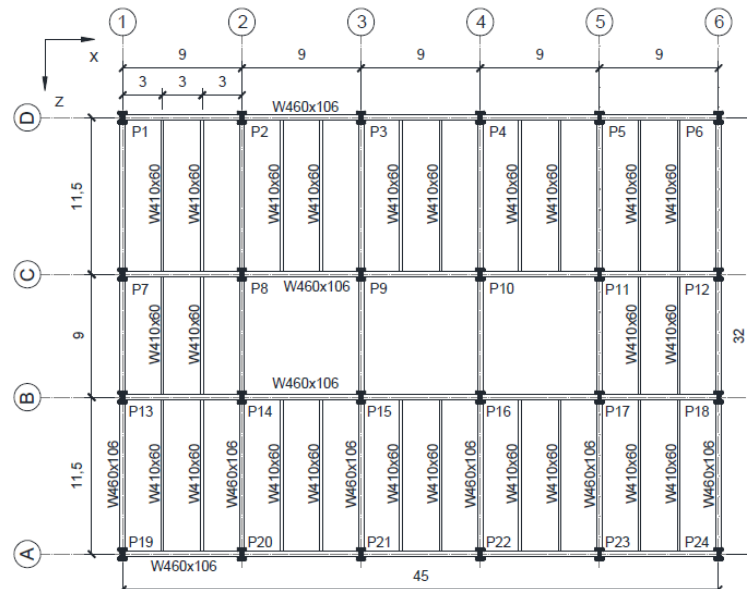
Structural project of the steel-concrete composite multi-storey building:  $H = 172.8$  m
